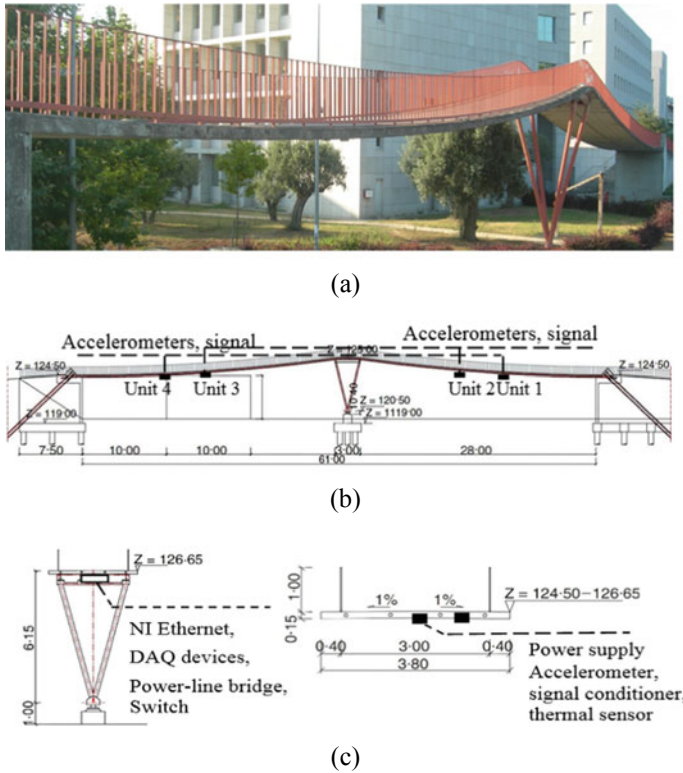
FEUP footbridge: a General view; b elevation with instrumentation layout; c section over column and instrumented cross-section
